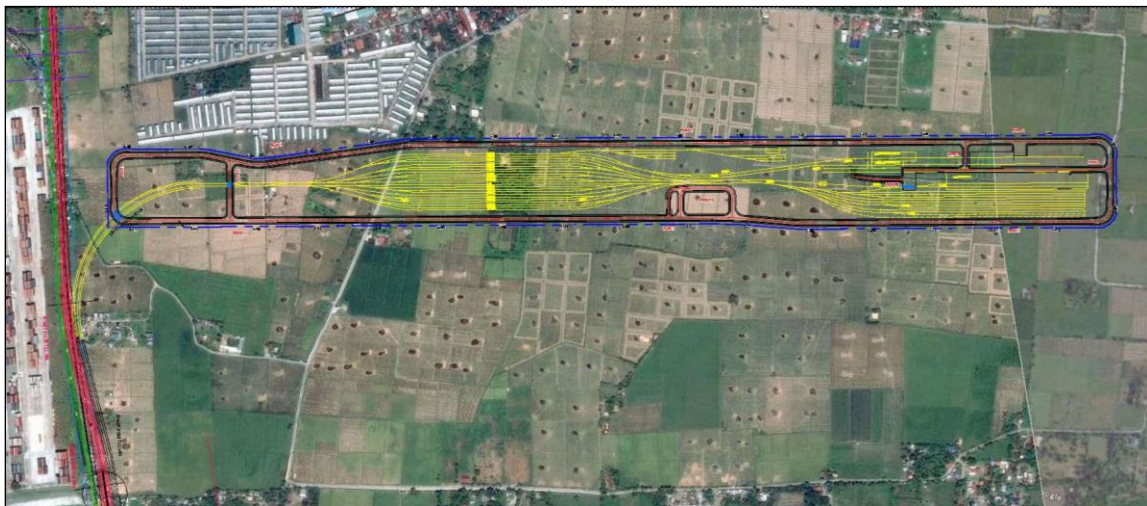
Sample Layout of the Depot Site (Source: JICA Design Team)
